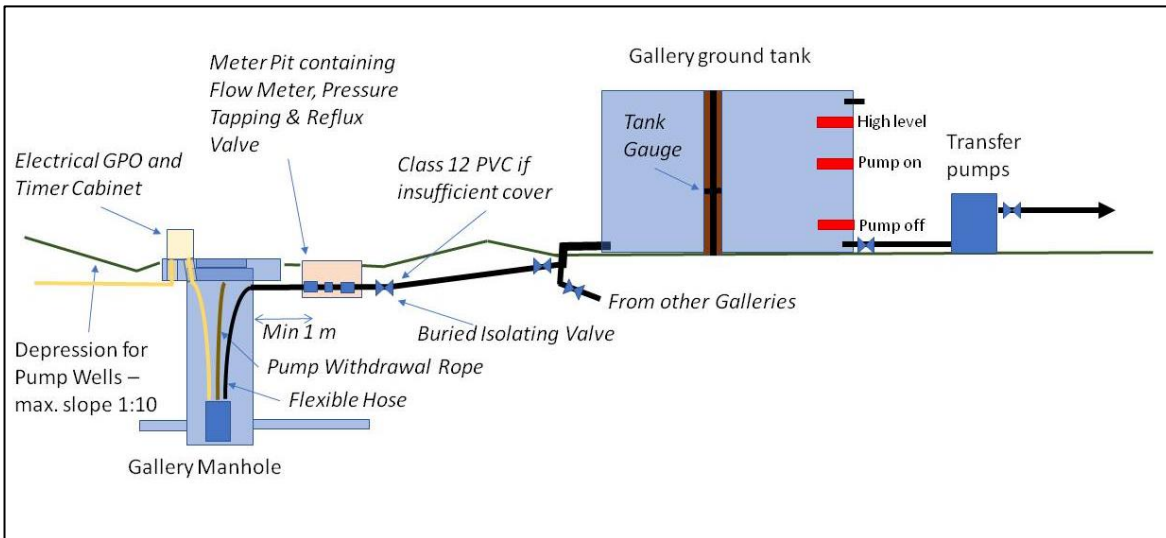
Gallery pump to GGT configuration (from Concept Report)
